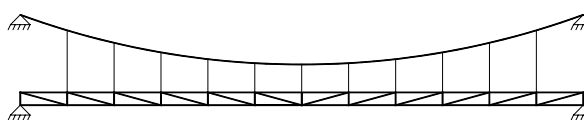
Suspension bridge stabilization by increasing of girder stiffness
